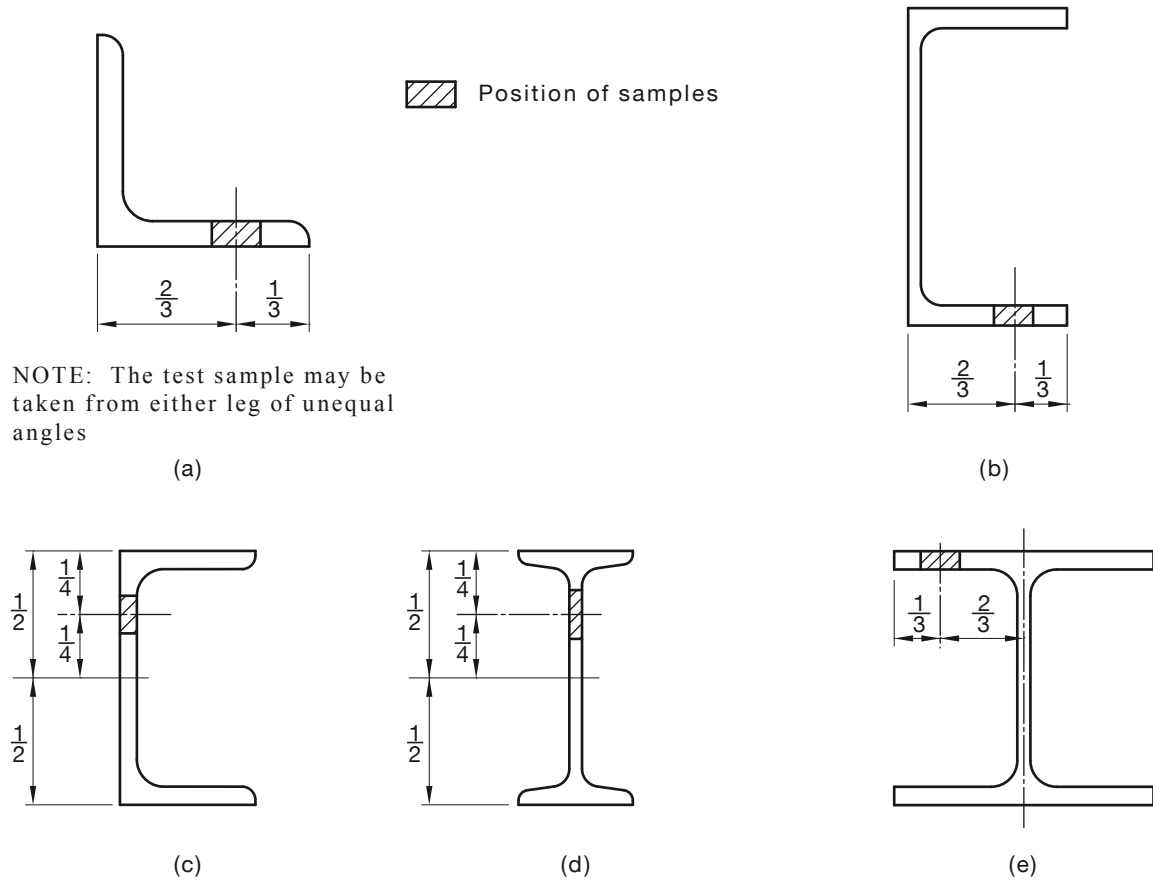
POSITION OF TEST SPECIMENS FOR TENSILE TESTS
